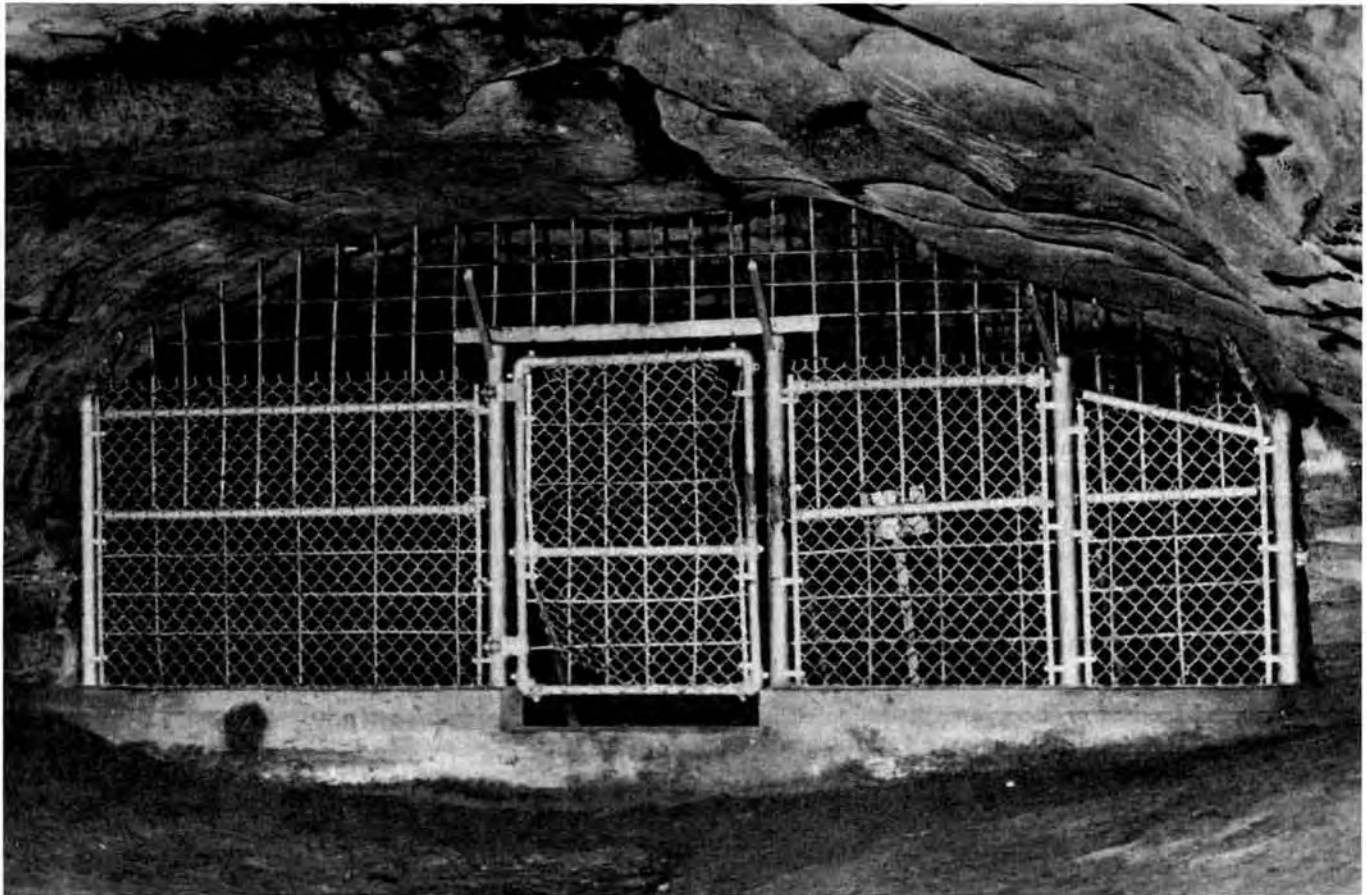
Georgetown Cave gate: vertical bars are too narrowly spaced, and fence covering further restricts bat movement. Concrete foundation projecting above floor level alters air flow.
